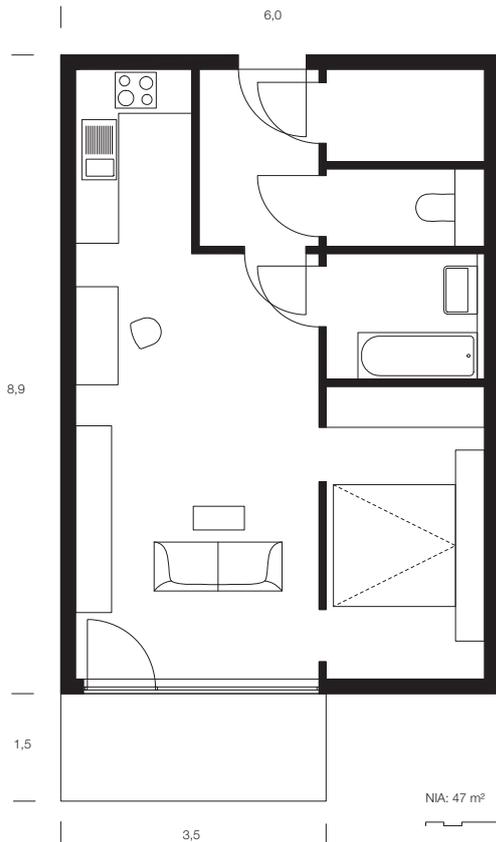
Type A apartment, Vienna - floor plan
